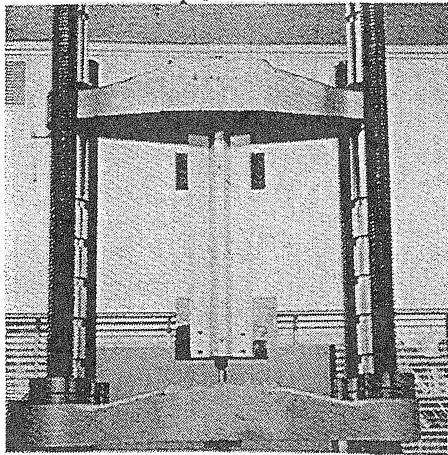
Test Set-up to Determine Tearing Load at the Edge Fastener
